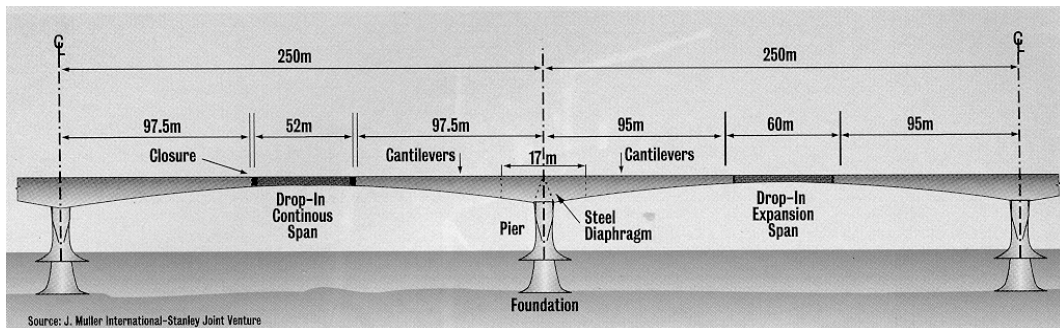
Drop in panels connecting haunched girder segments at the Northumberland Strait Crossing.⁴⁰
